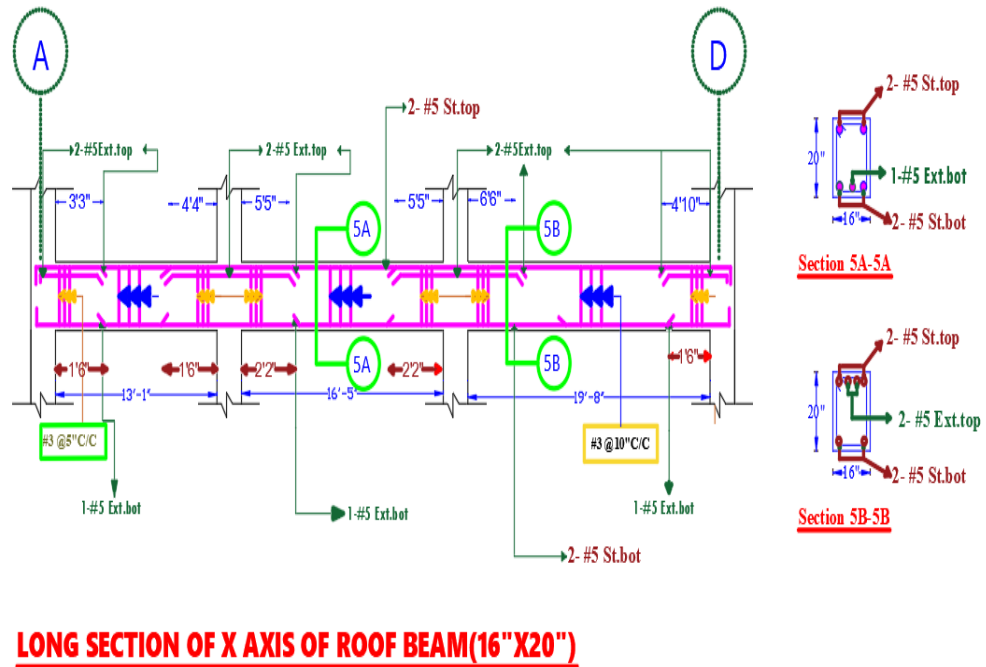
Long and Cross Sections of X Axis of 5<sup>TH</sup> Floor Beam (16" X 20")
